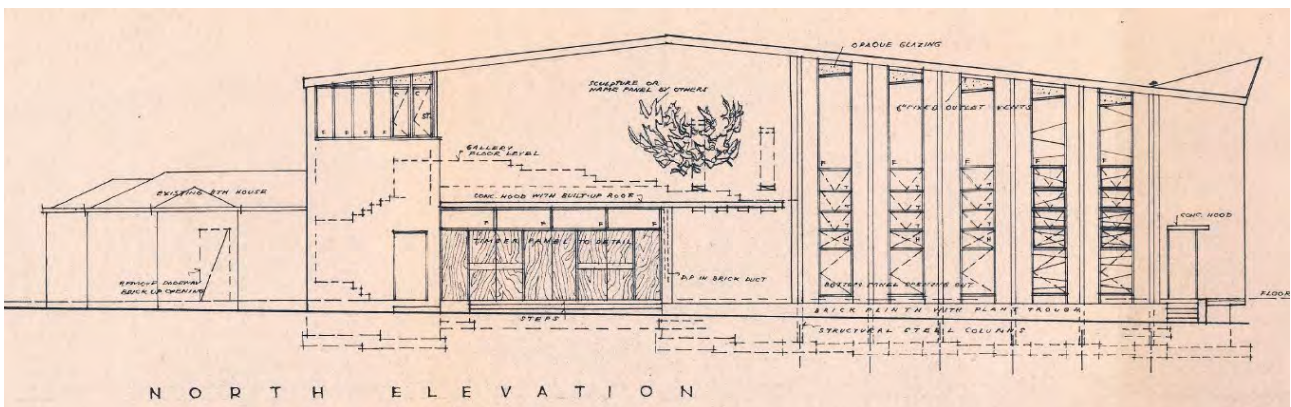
Drawing dated July 1961 (Dr. Ernest Fooks), showing north elevation. (Source: Council Building File)
